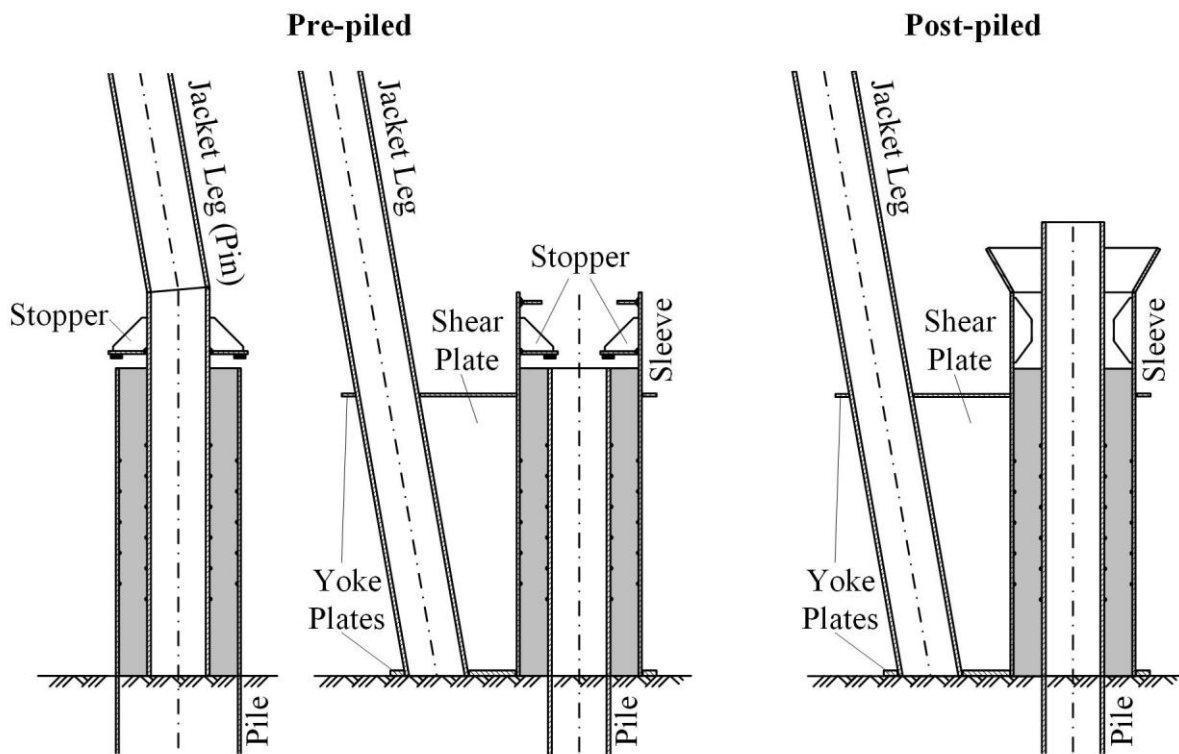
Schematic grouted connection designs for different installation procedures of jacket support structures
